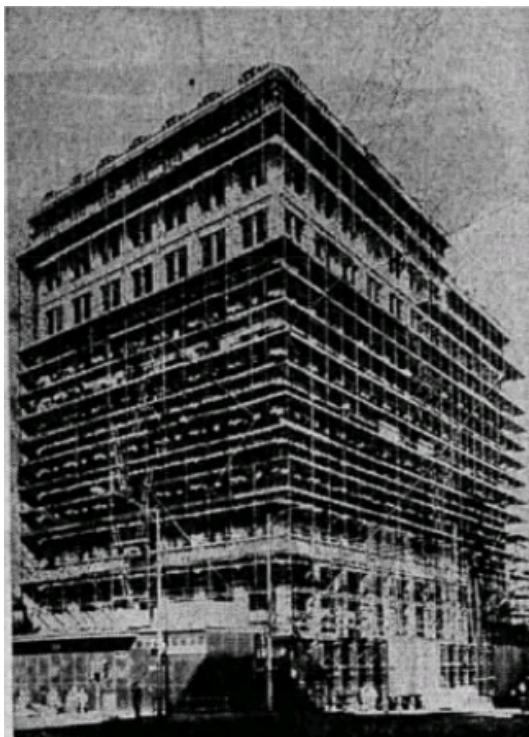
New Legal & General House under construction, 1966. (Source: *Age* 25 October 1966:13)
